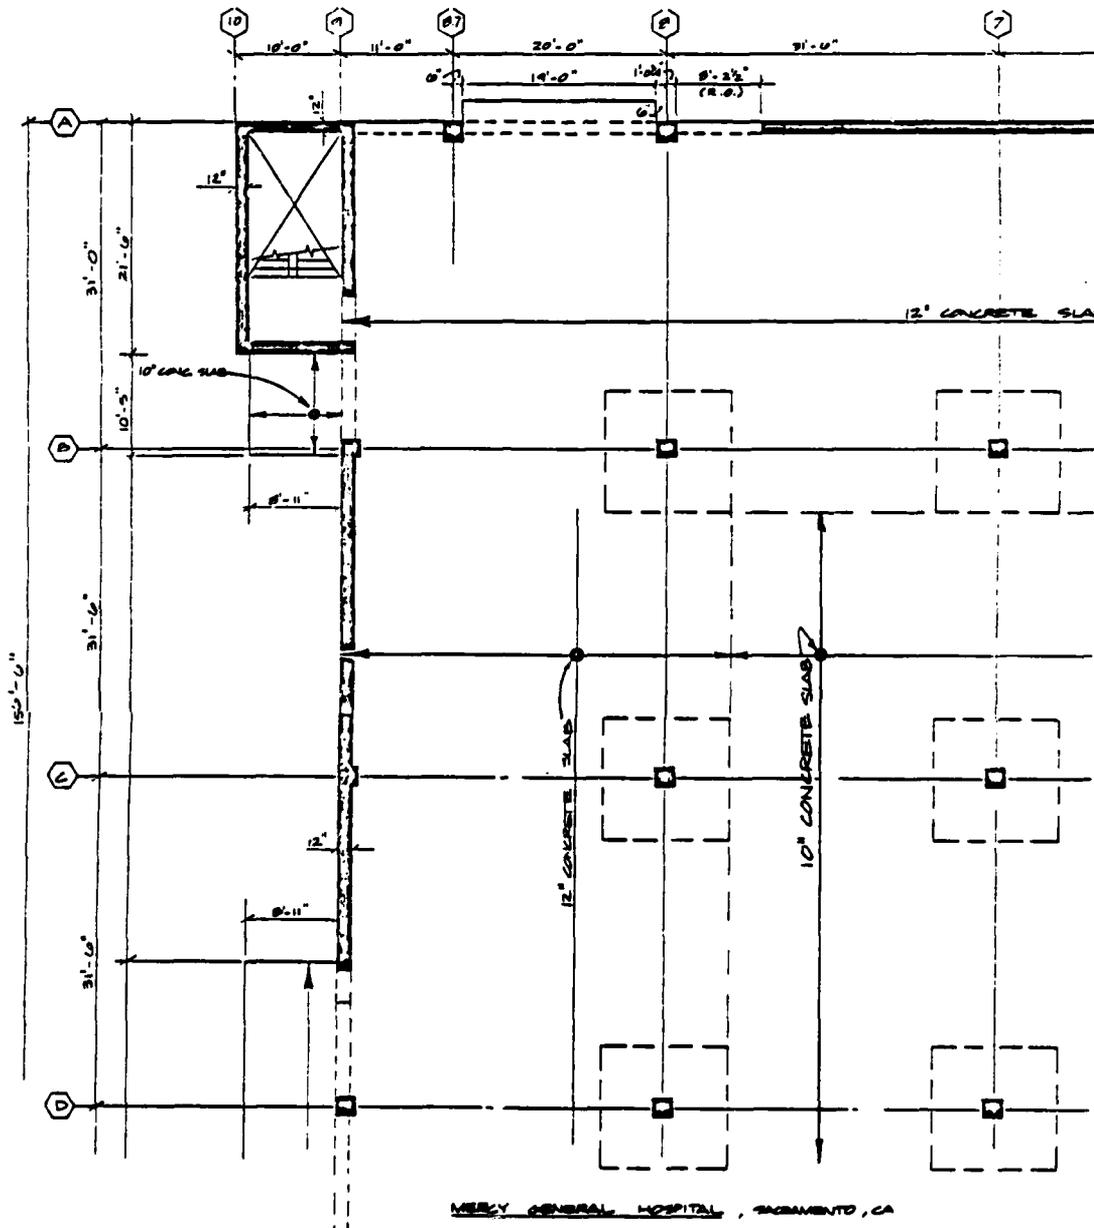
First Floor Framing, Mercy General Hospital.
